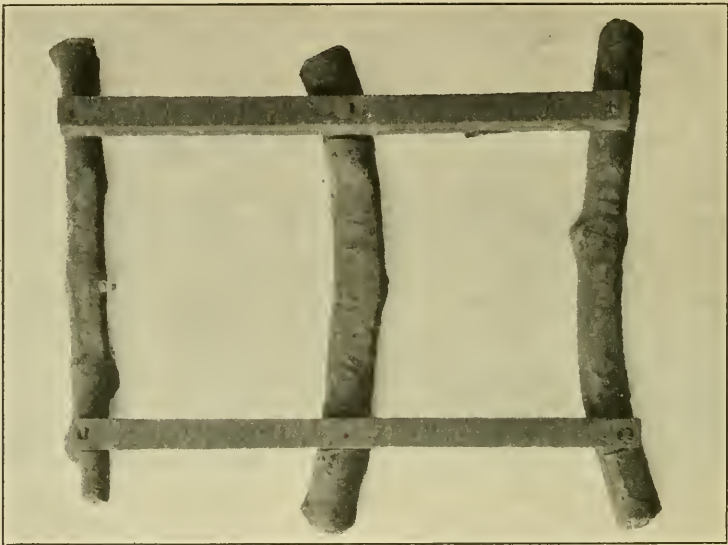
MODEL OF WOODEN RAILWAY AT NEWCASTLE, ENGLAND, 1672.
